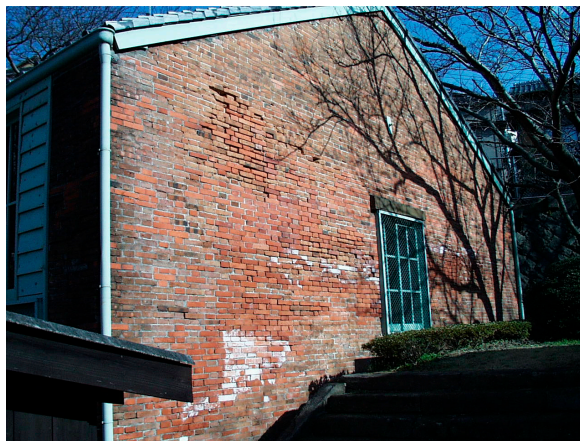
The winch house of the Kosuge slip dock (1868), one of the oldest brick masonry buildings in Japan. The bricks used in this building were manufactured under the direction of Dutch technicians.
